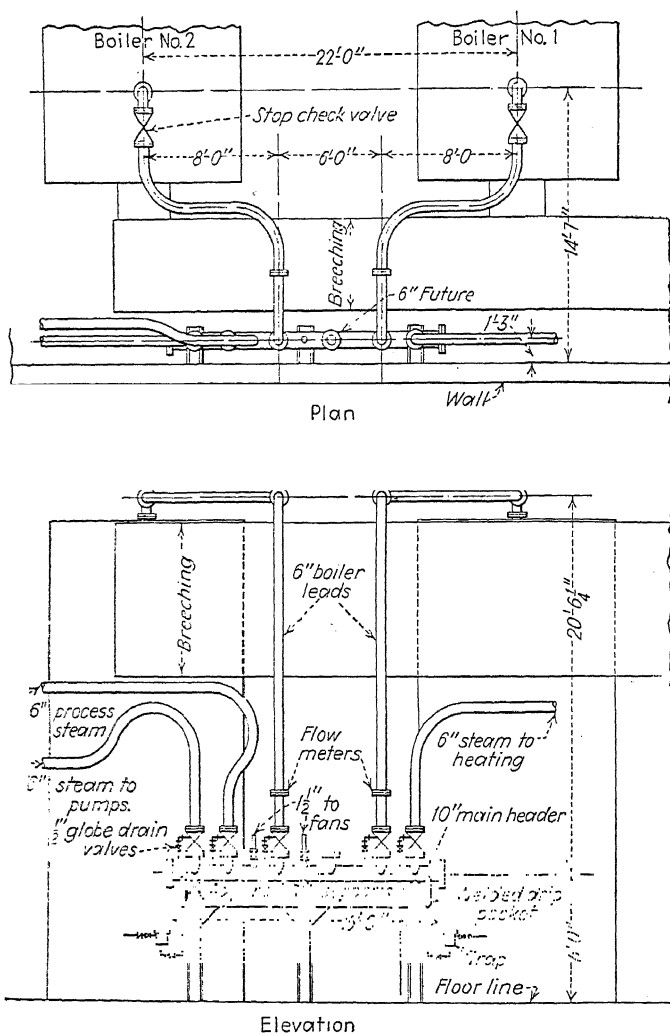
Typical plan and elevation of steam header in modern industrial plant.
